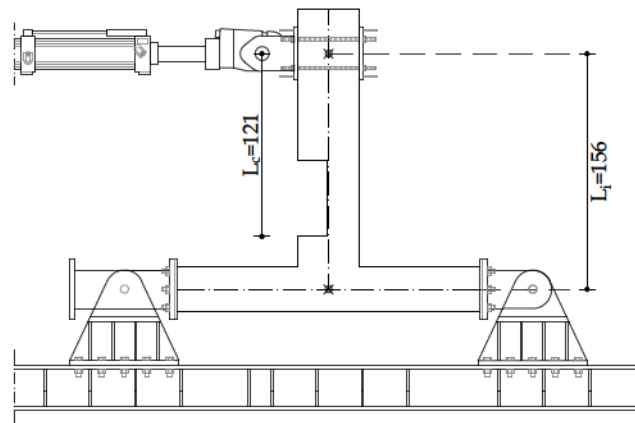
Test layout of innovative specimens (units: cm).
